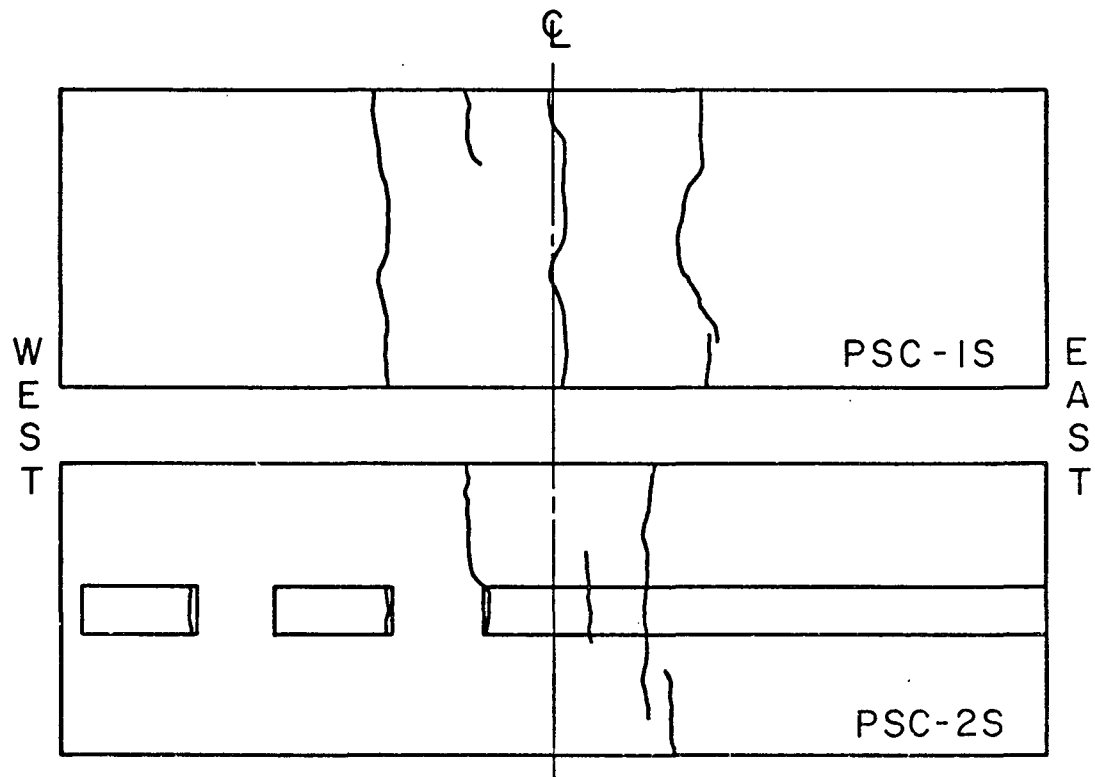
SLAB CRACKING AT THE MAXIMUM LOAD
